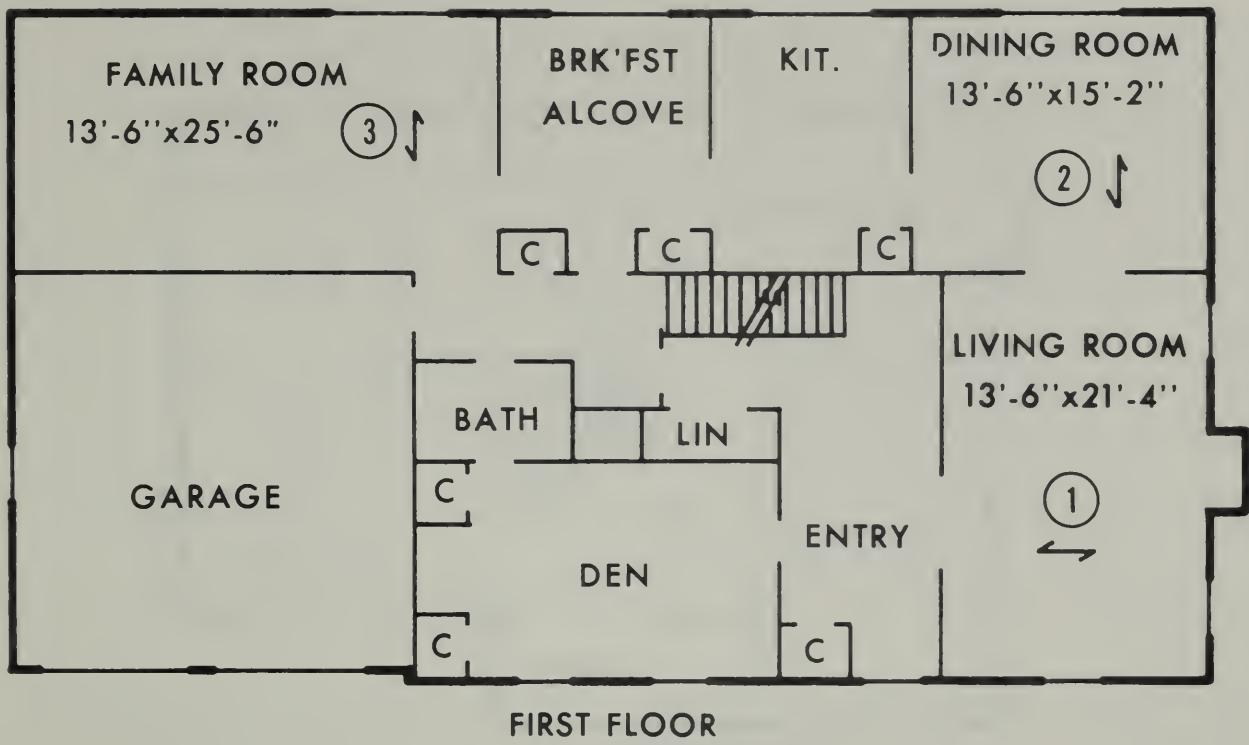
FLOOR PLAN OF HOUSE NO. 1
